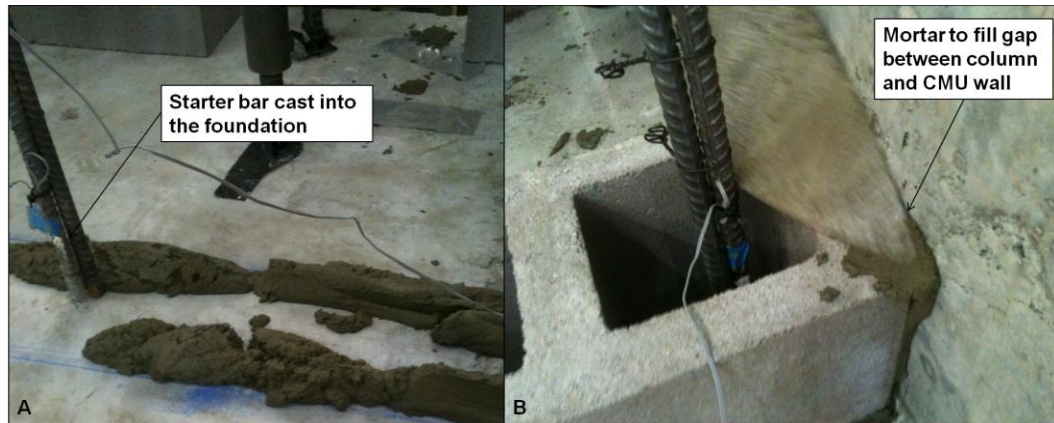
Placement of first row of masonry showing (a) the dowel bars and (b) the mortar at the wall-column interface
